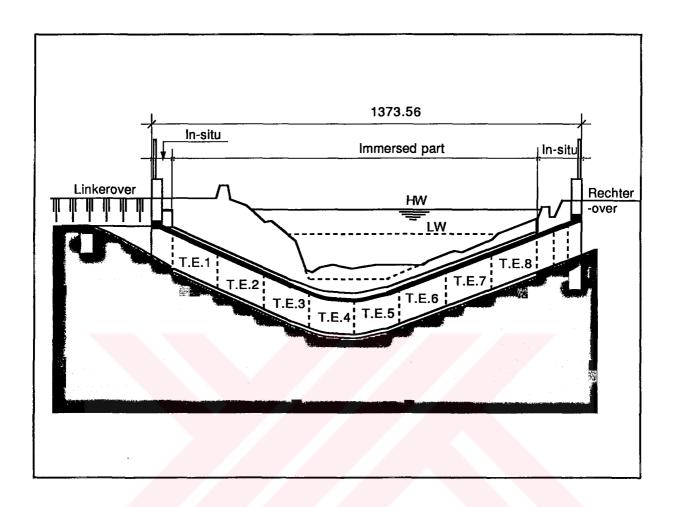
LONGITUDINAL SECTION (In meters)
